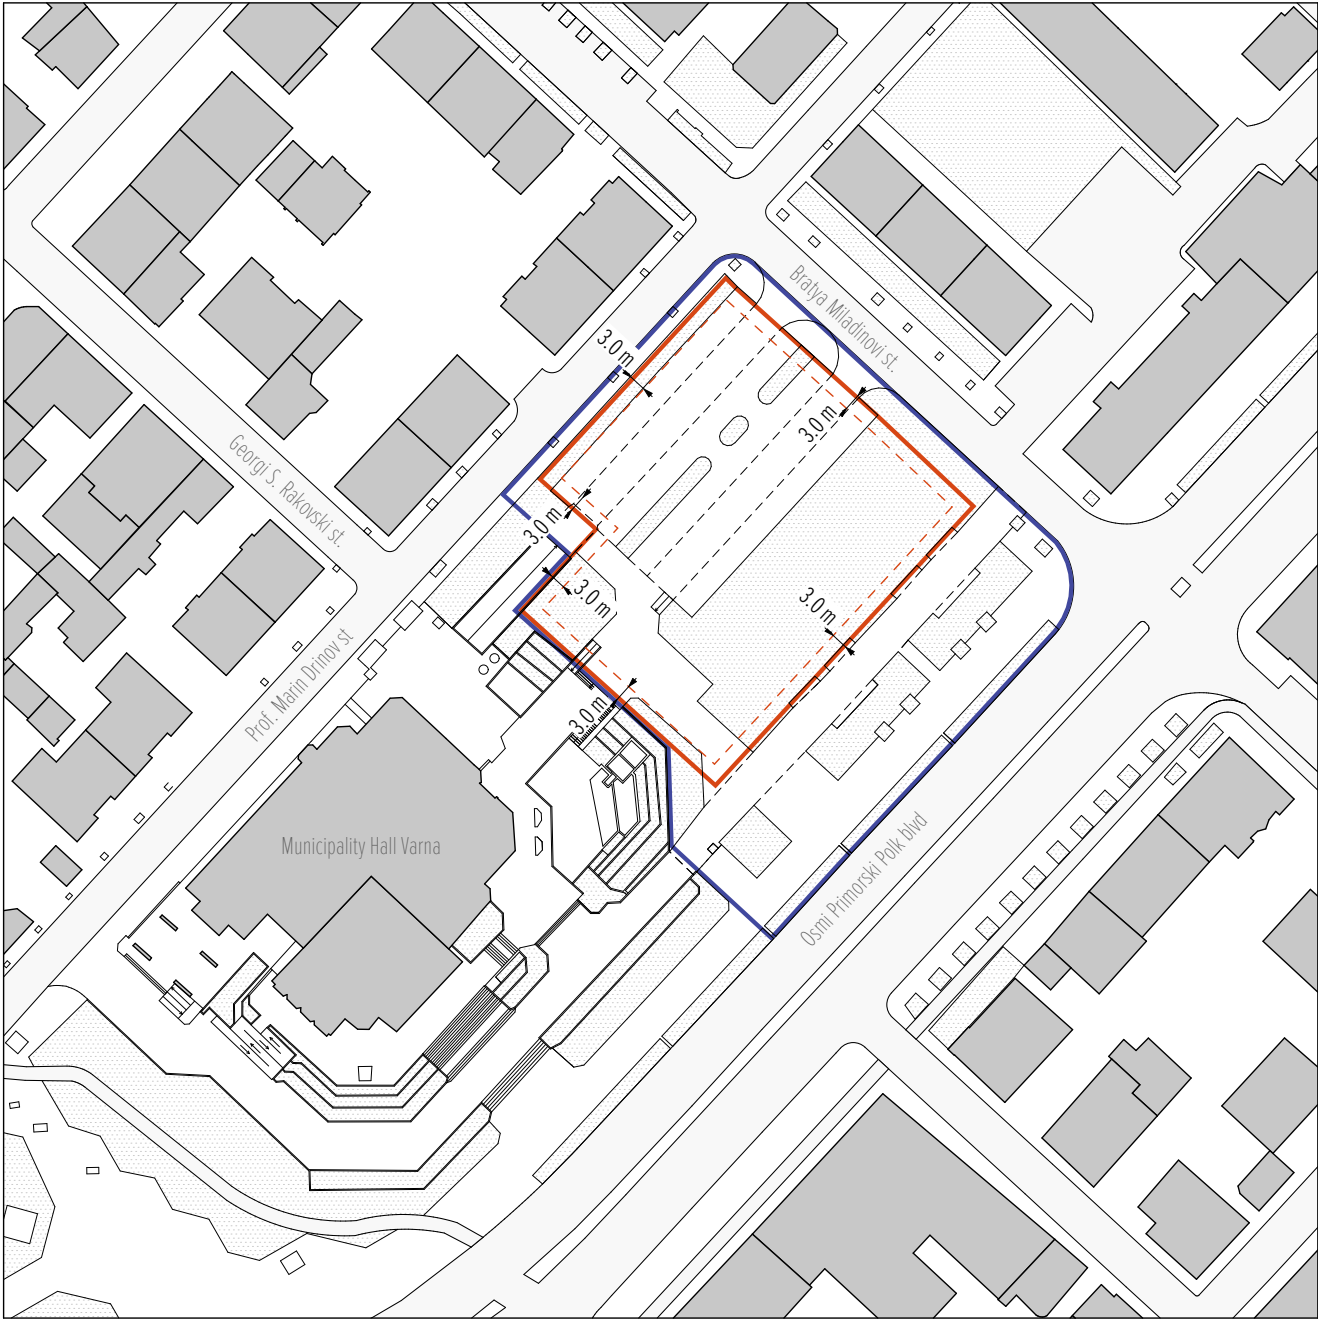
Overground construction area (dashed line), underground construction area and expanded competition area (pale outline)
